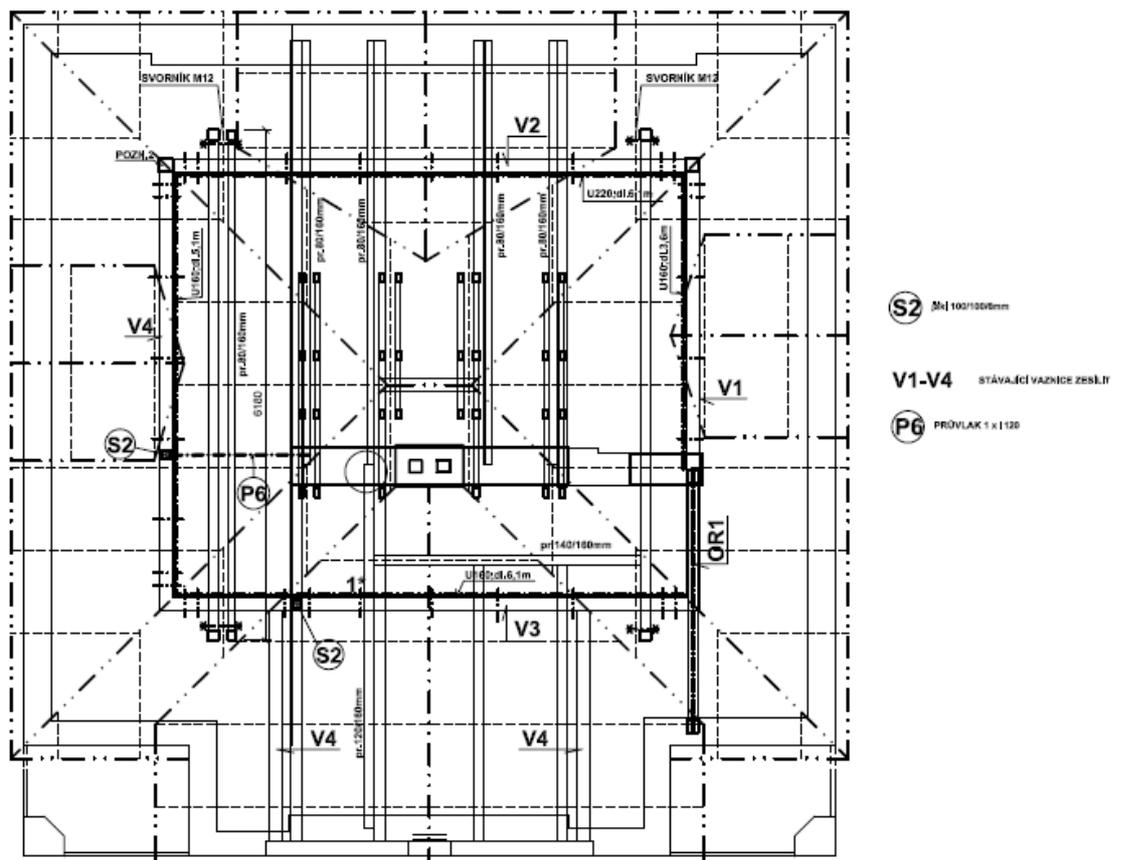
proposed changes to the truss and ceiling above the 1<sup>st</sup> floor
